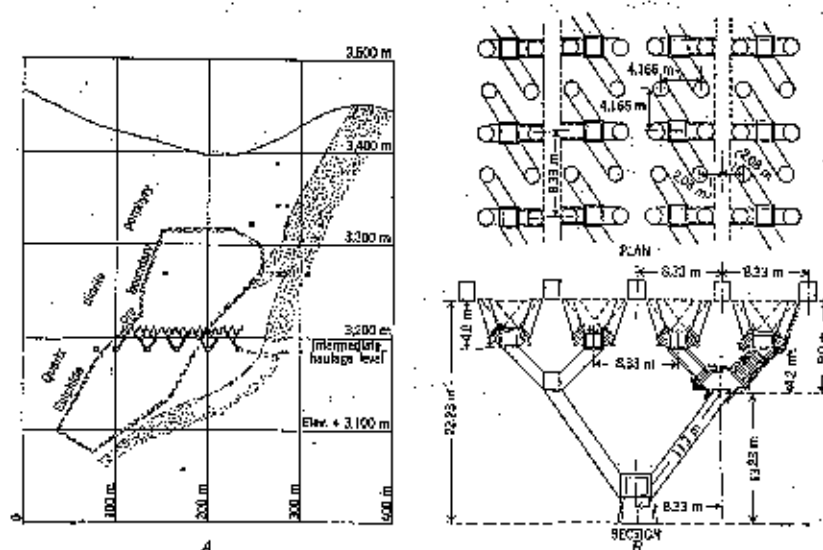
Undercutting, Andes Copper Mining Co., Chile: A, Transverse section, south sulphide ore body; B, plan and section showing branch-raise system.
